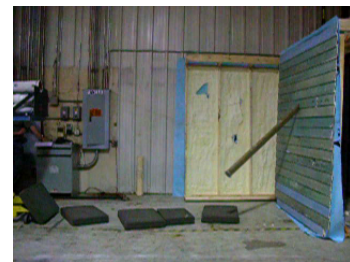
Wall 2 (Insulating Sheathing + Housewrap + 2" Closed Cell Spray Foam) pass at 43 fps
